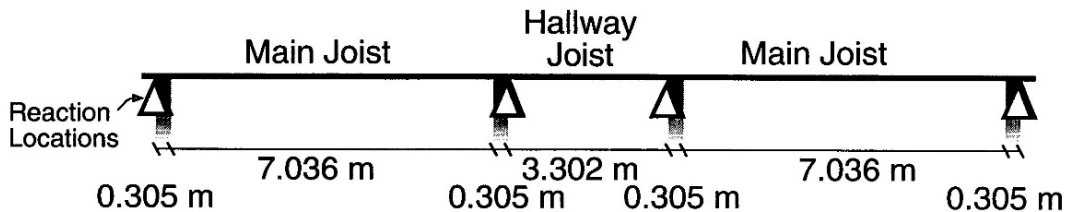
Layout of OWSJs as Modeled in Wind Tunnel Tests
